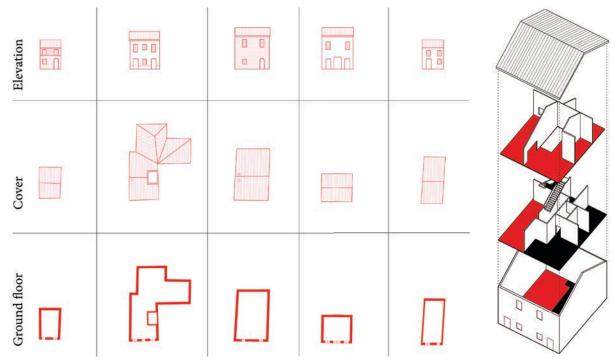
Typological abacus of some buildings overlooking Via Lavatoio, Rimini and an exploded axonometric composition of a typical building. The abacus includes ground floor plans, roof plans and elevations.
